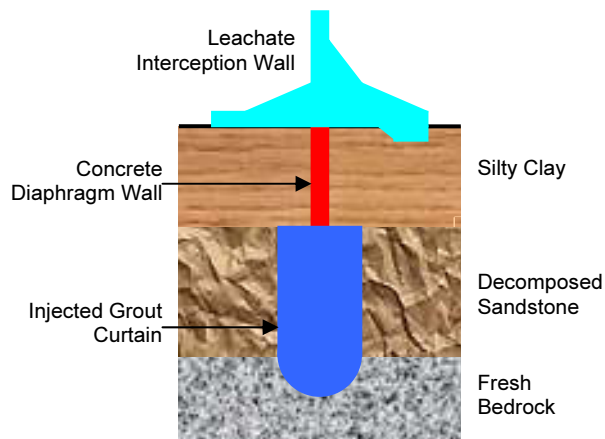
Typical structure of vertical barriers used at the valley landfills in China
